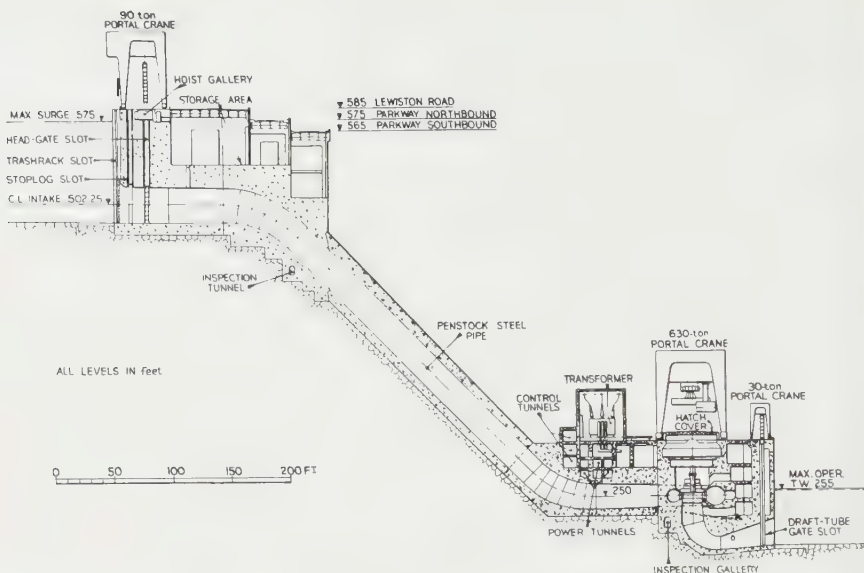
Section through the Robert Moses Niagara power plant. (Courtesy of New York State Power Authority. Uhl, Hall, and Rich, Consulting Engineers.)
